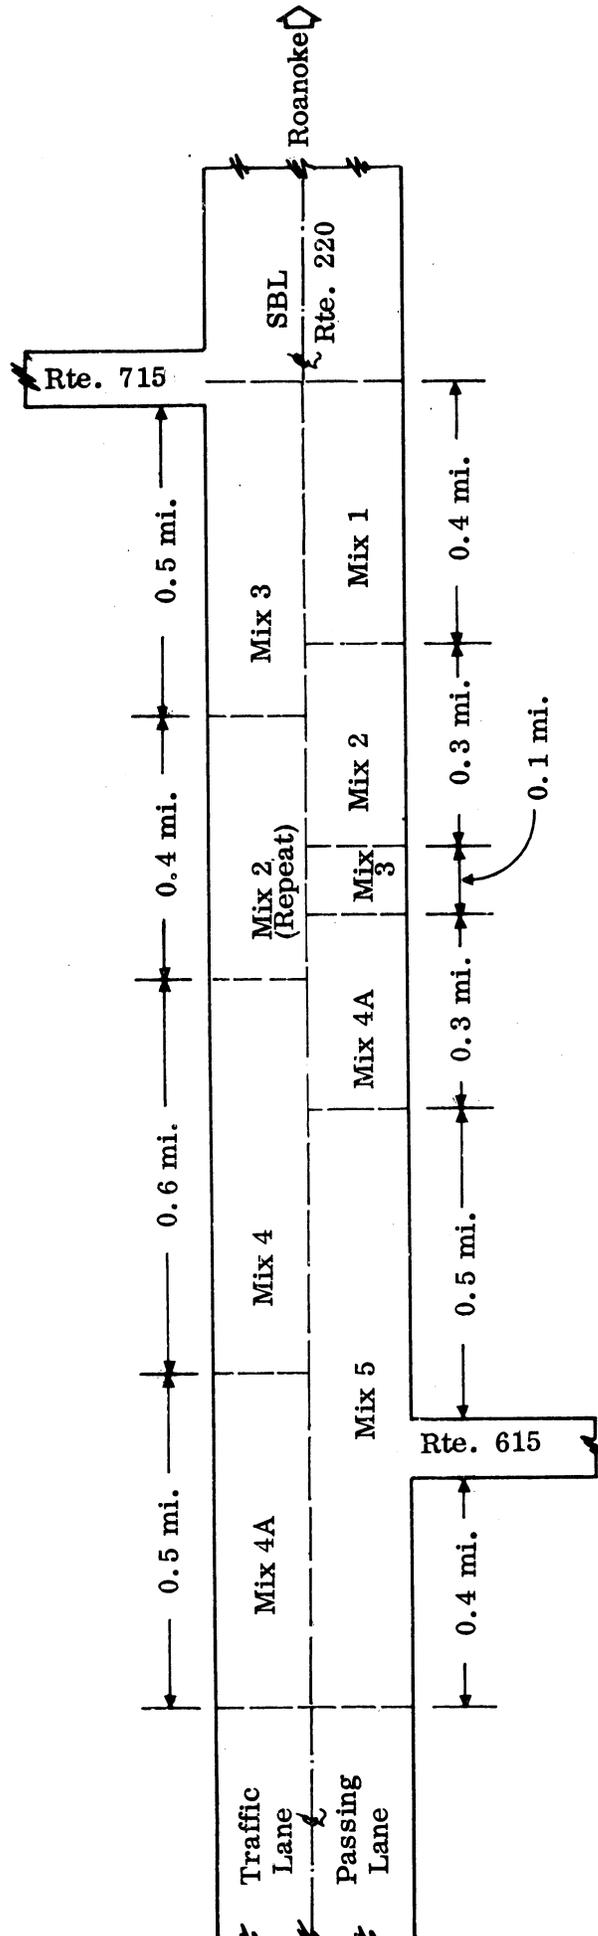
Location of Solite test sections — Route 220 — Roanoke County.
